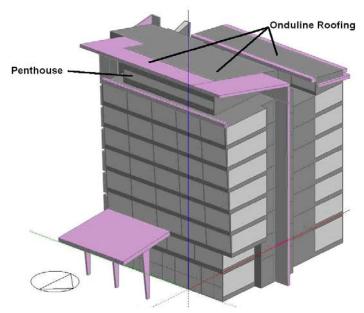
Drawing of Building from the North Side and the Penthouse's position
